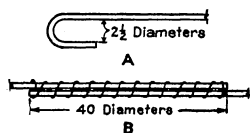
Joining reinforcement: A, Hook; B, splice.
